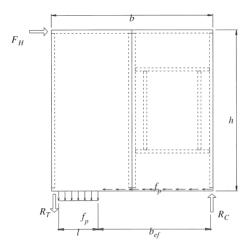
Plastic model for the WB-series based on visual observation at failure. The tension at the central studs is not developed.
